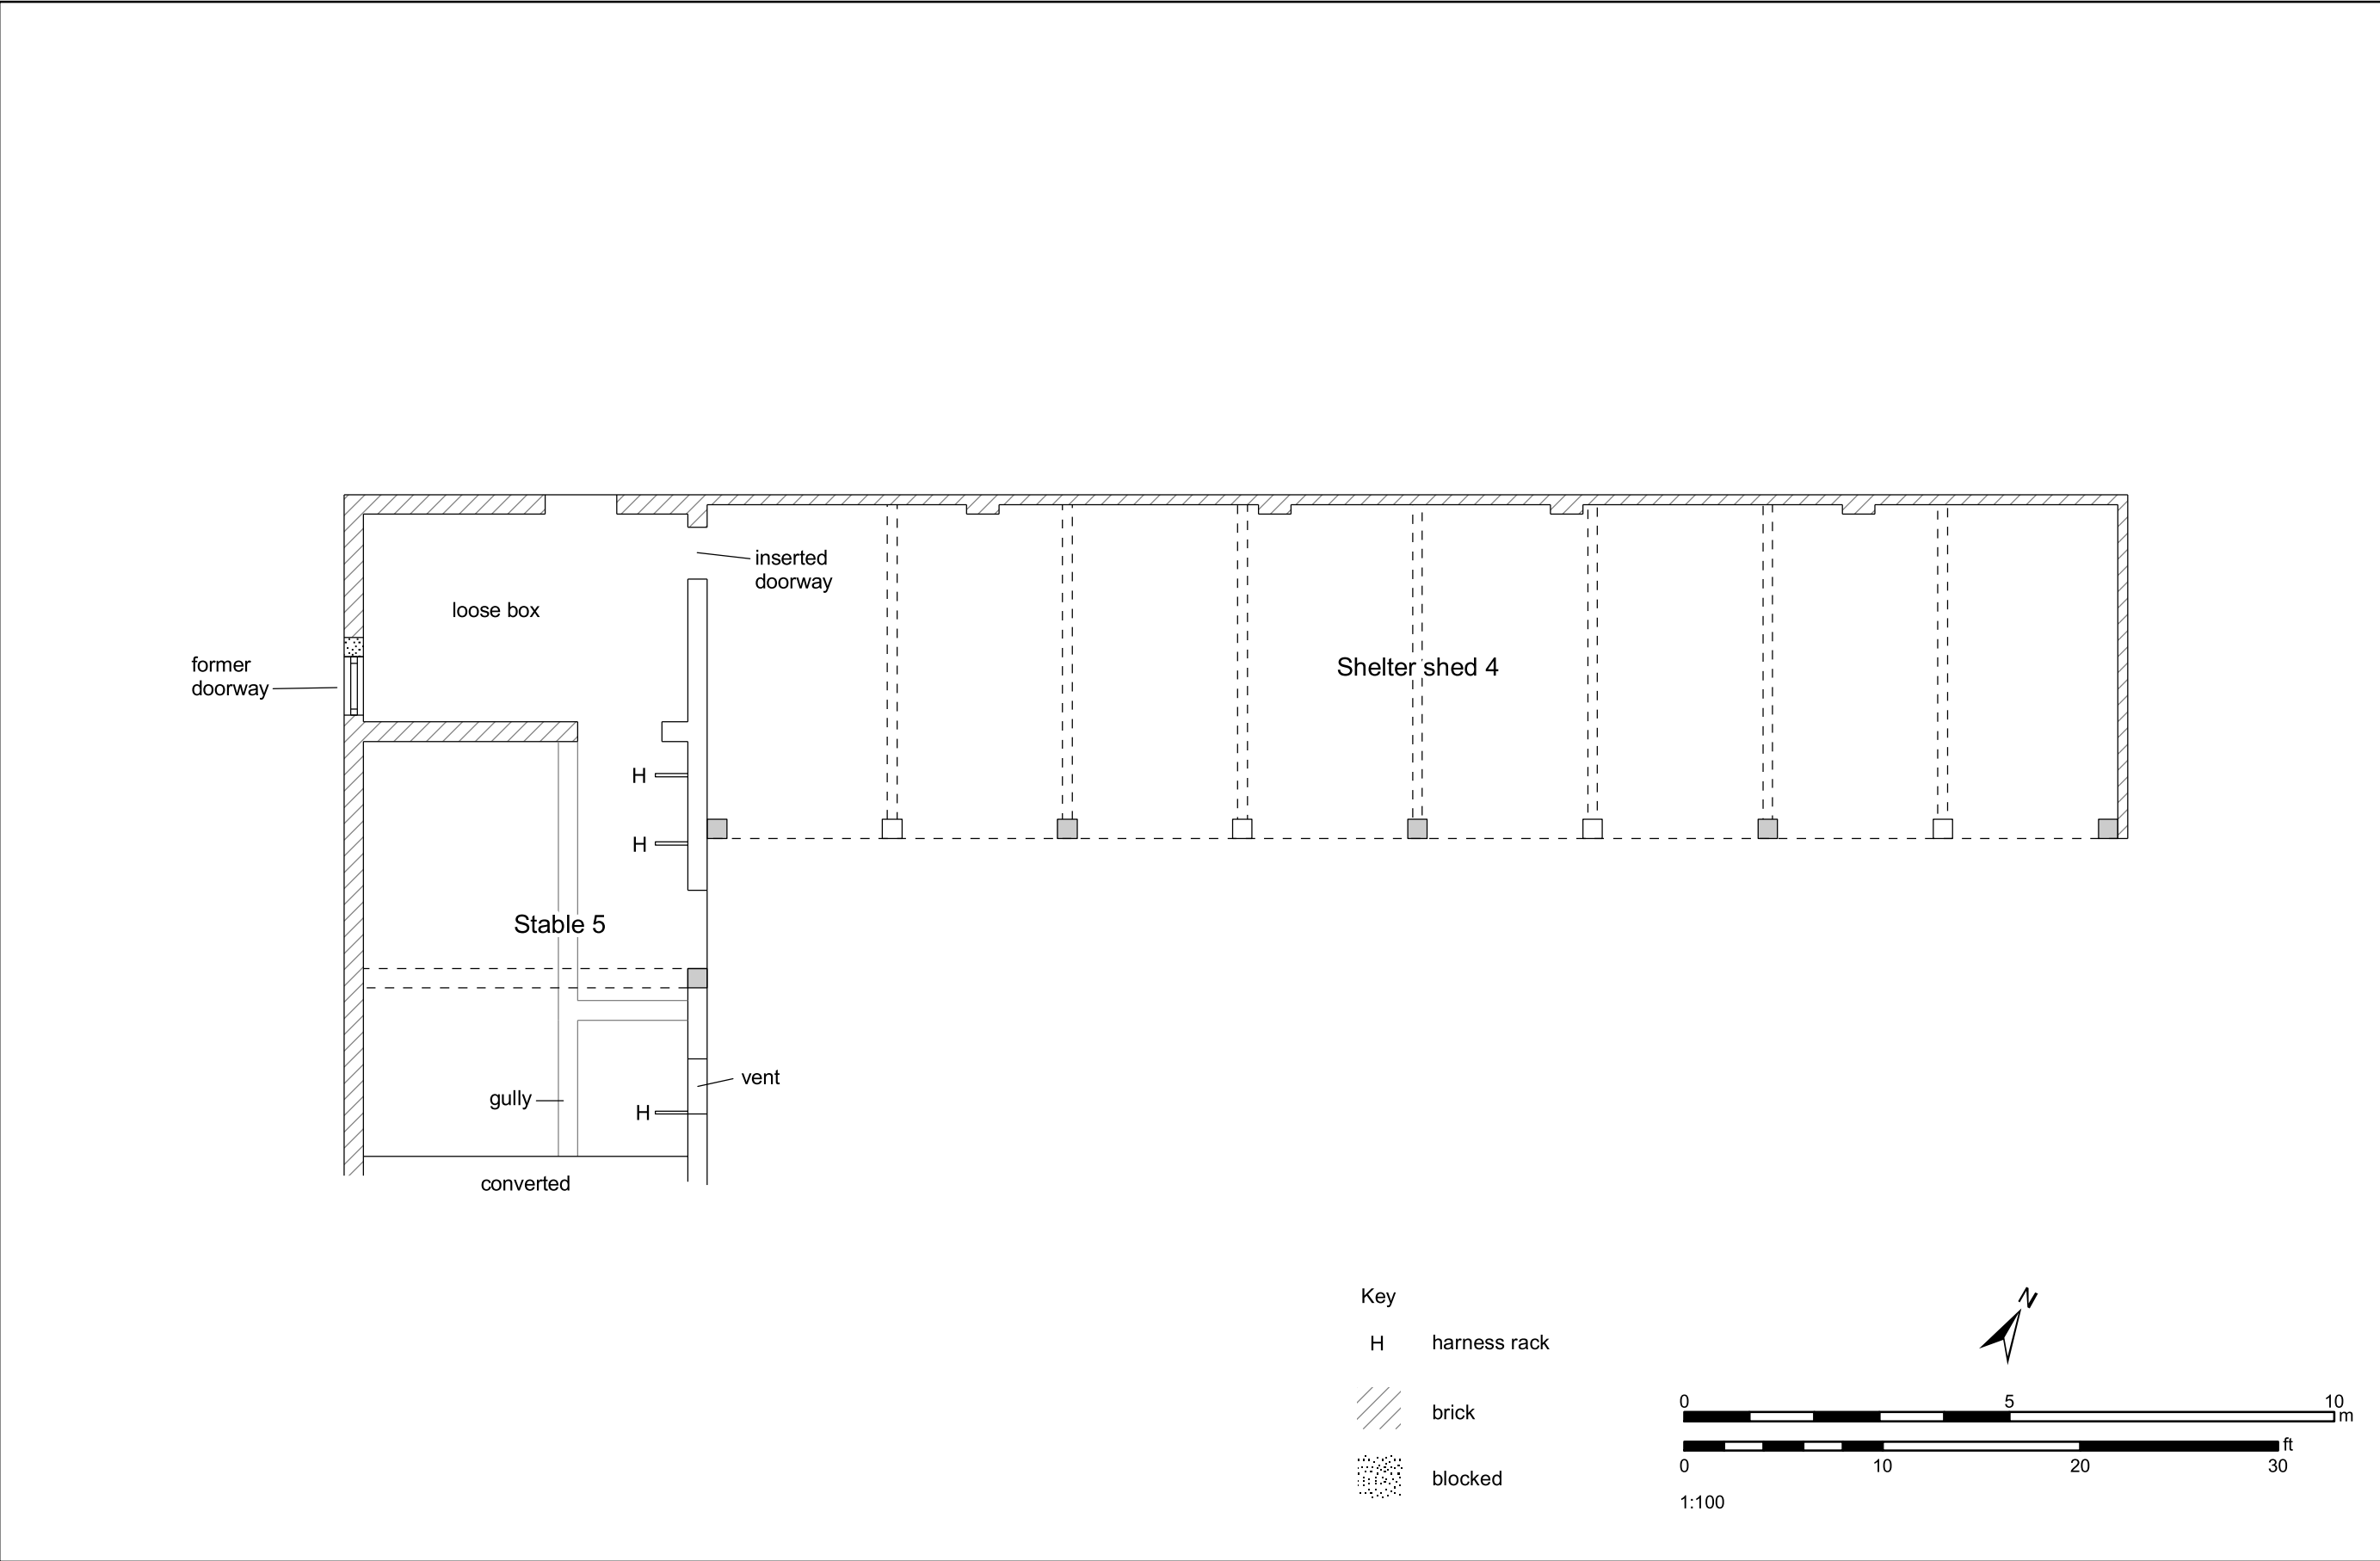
Plans of farm structures to be converted : buildings 4-5
